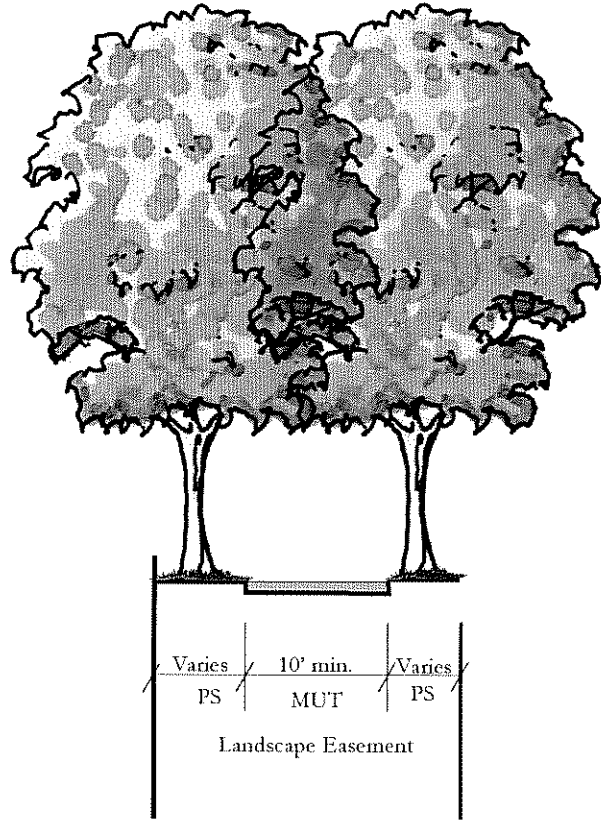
Conceptual Multi-Use Trail Next to Local Street Segment
